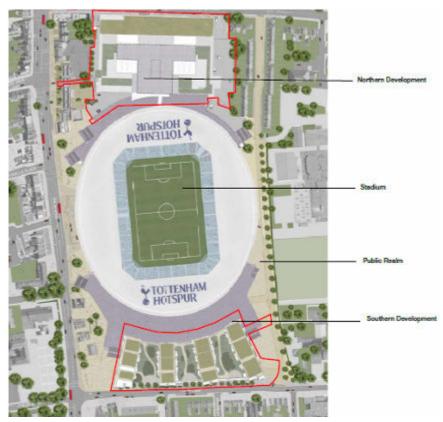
Site plan with application sites edged in bold. Source: Applicant's Design & Access Statement (Dec. 2011).
